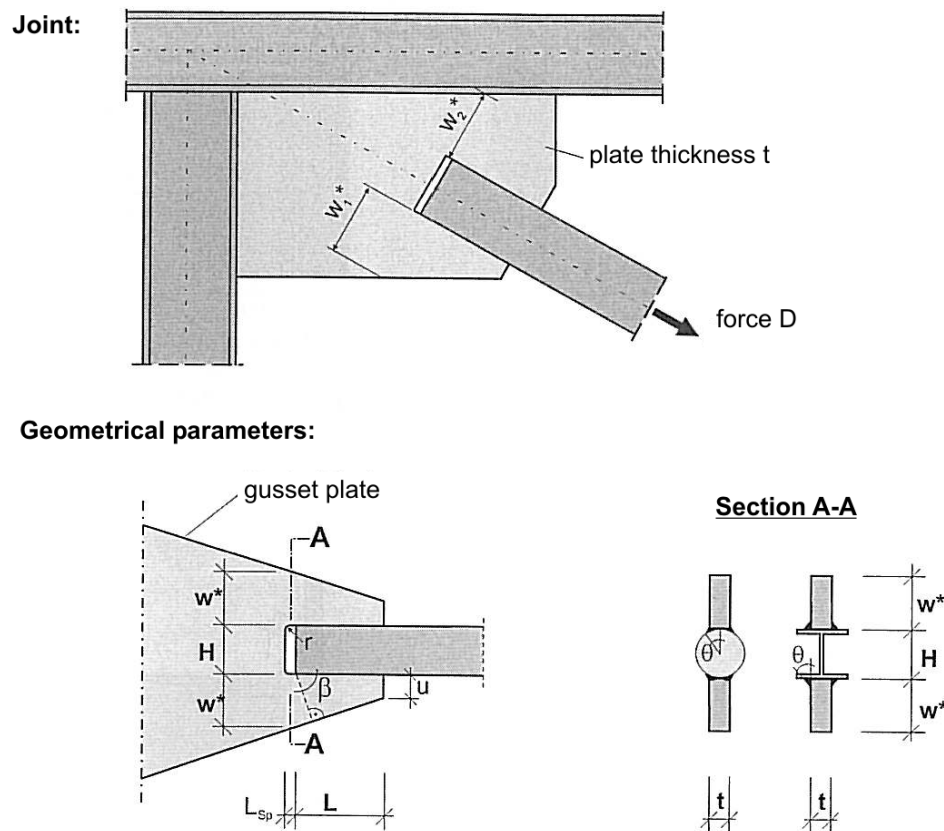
Definition of geometric parameters and relevant cross-section A-A
